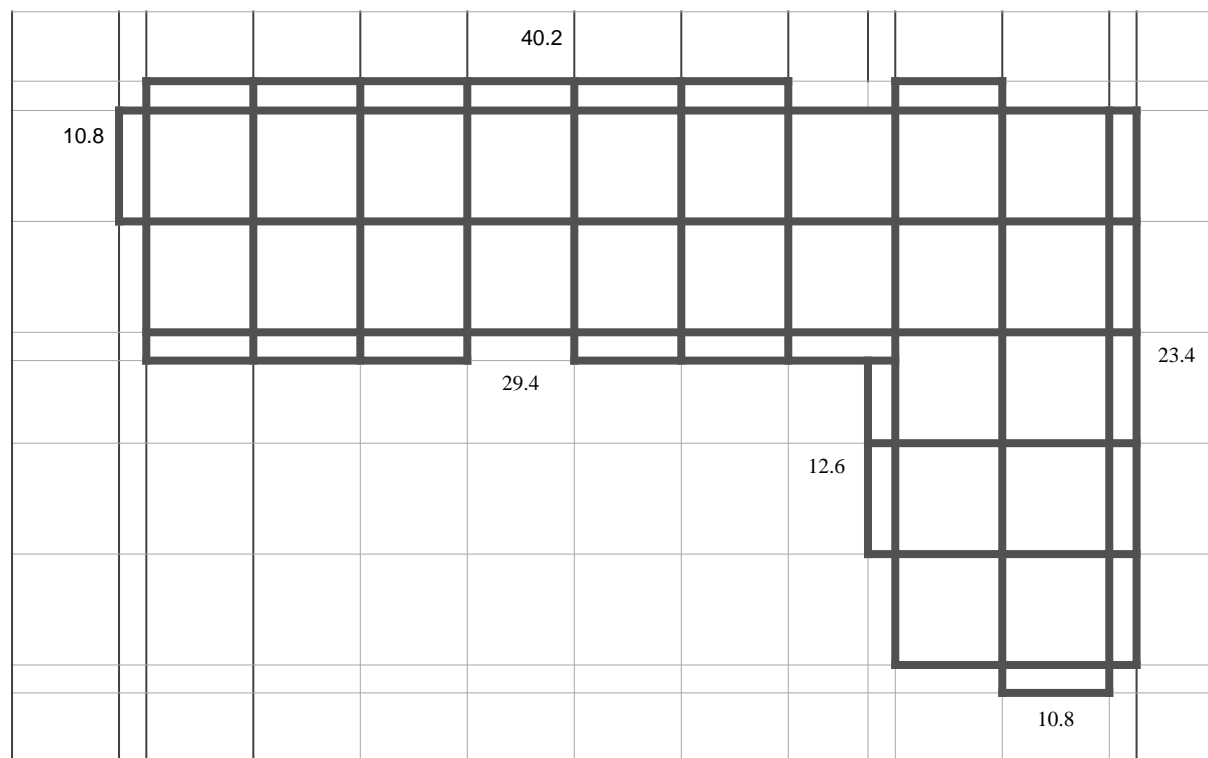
Typical Floor Plan of Islamic Affairs Building
